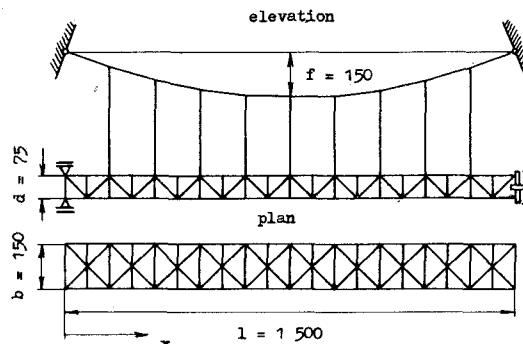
Four-walled suspended structure built up with two stiffening trusses and two horizontal trusses.
